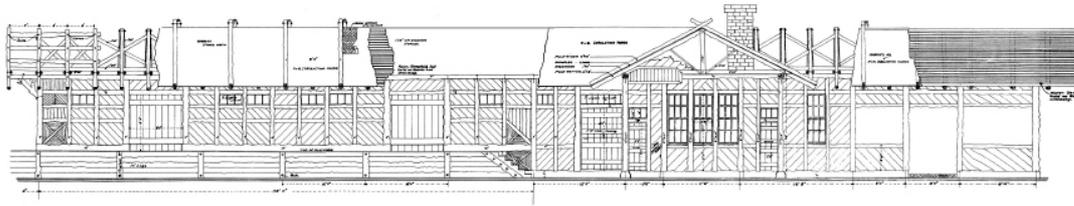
Rustic railroad station elevation drawing (Burgess 2007)
